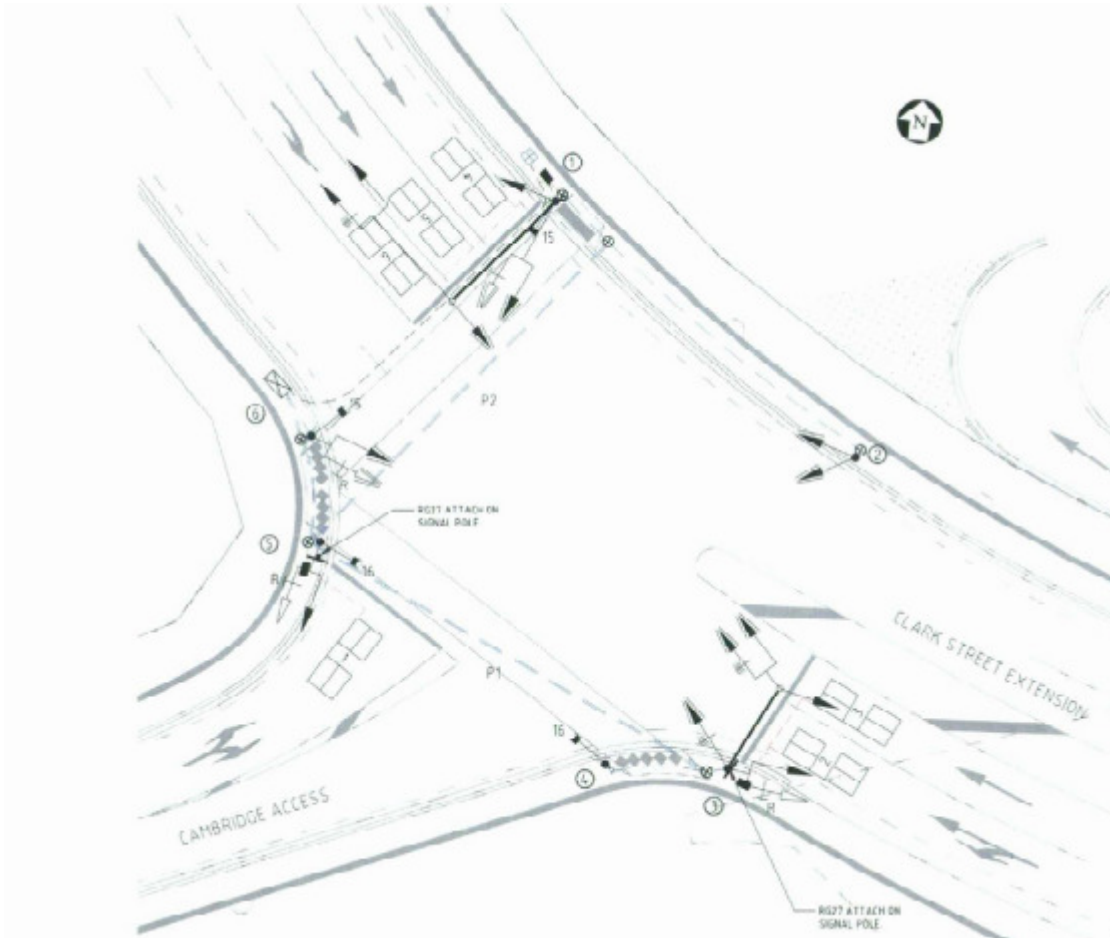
CLARK STREET EXTENSION; TRAFFIC SIGNAL DETAIL
